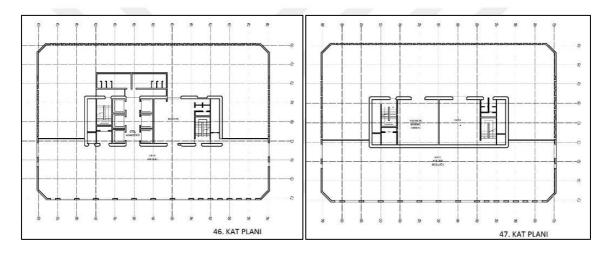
Forty-sixth and forty-seventh floor plans of Mersin Metropol Building
